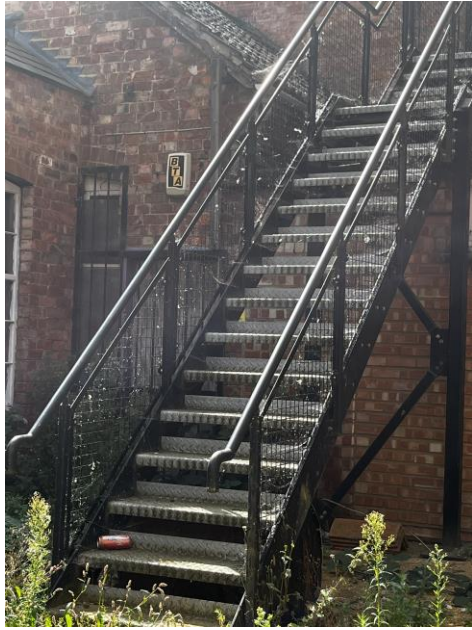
External Stairs located close to the site at the rear of No.2 Alfred Street.
